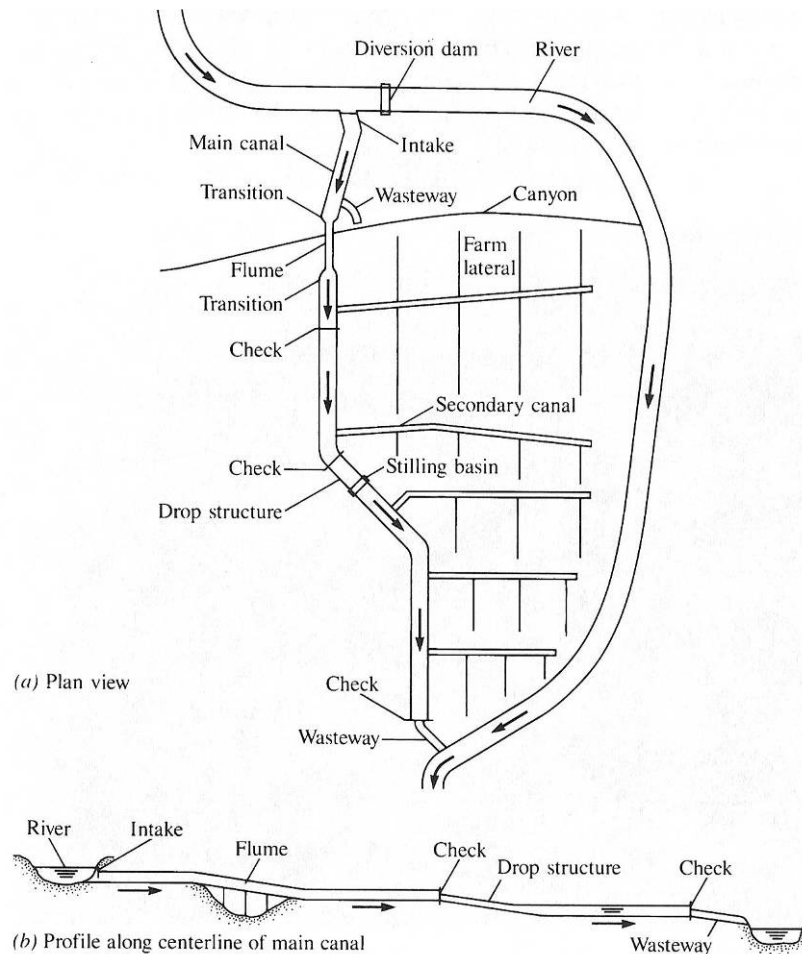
Layout of irrigation system (a) Plan view (b) Profile along centerline of main canal
